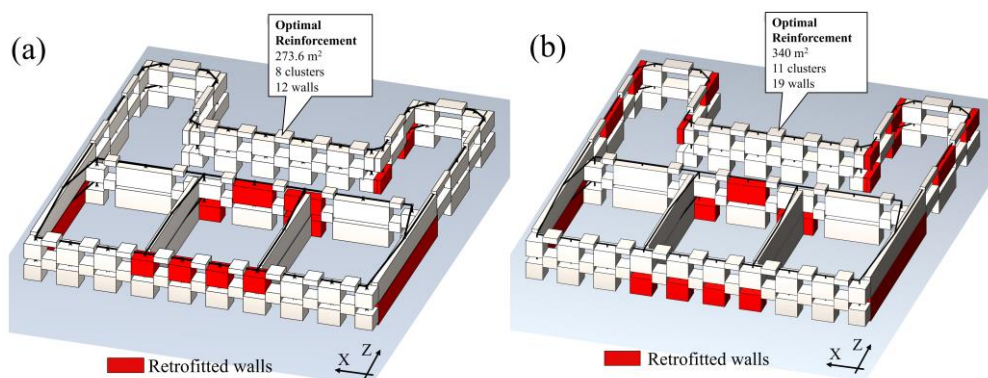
Optimal reinforcement layouts for the case studies: (a) Squared stone masonry (SSM); (b) Tender stone masonry (TSM).
